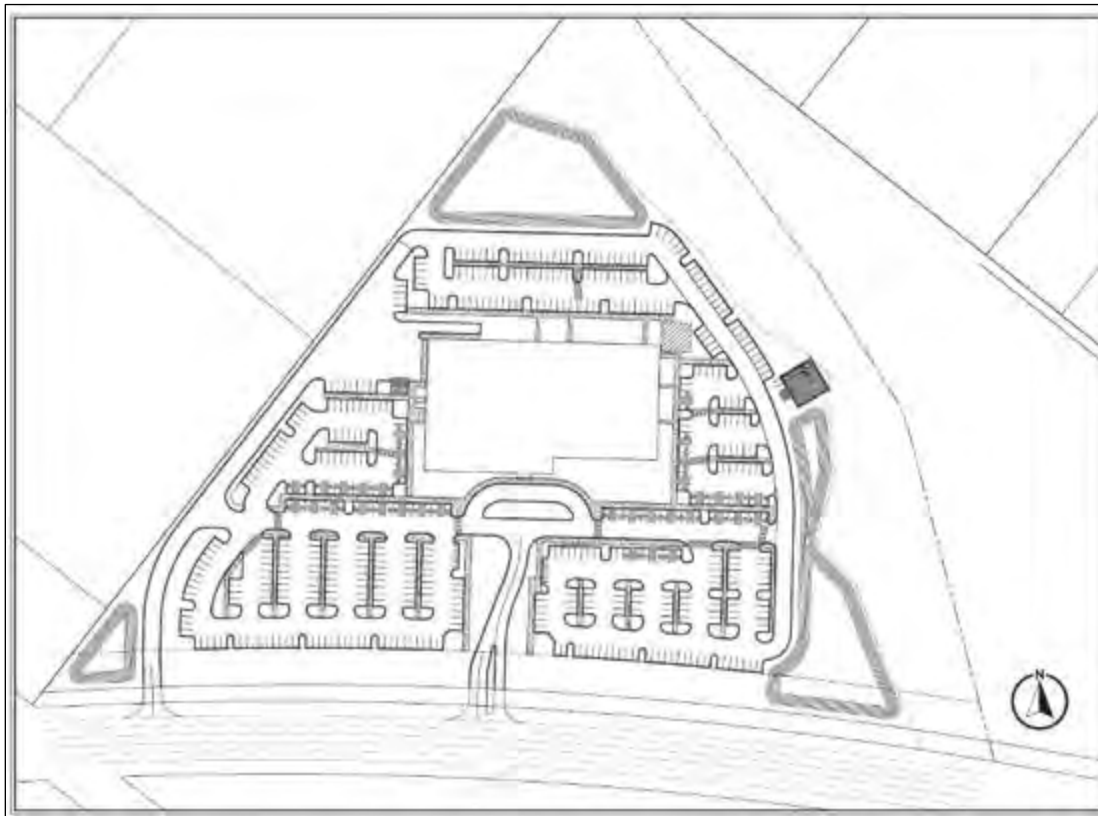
Site 2 Proposed OPC Concept Development Plan.
